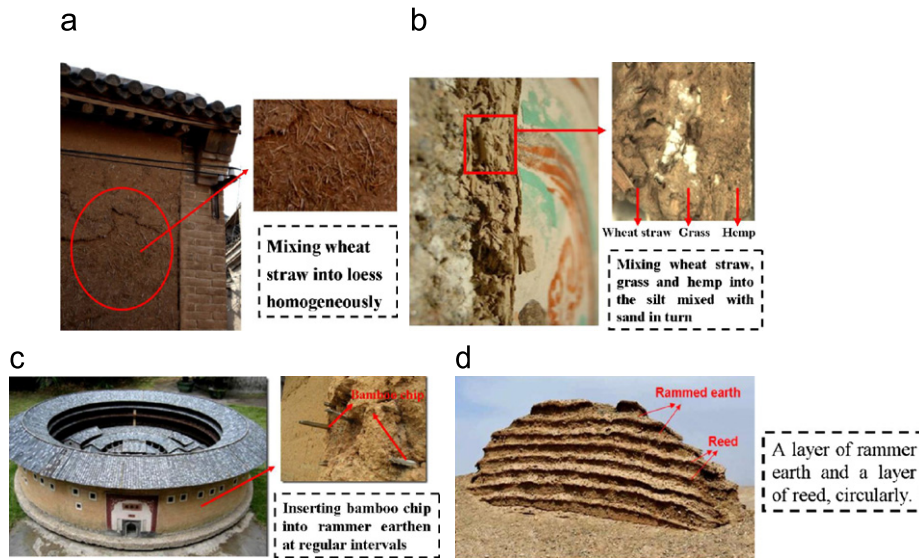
Traditional buildings constructed of reinforced soil. (a) Rammed Residence, (b) Mogao Grottoes Mural, (c) Hakkas Earth Buildings, (d) Han Great Wall.
